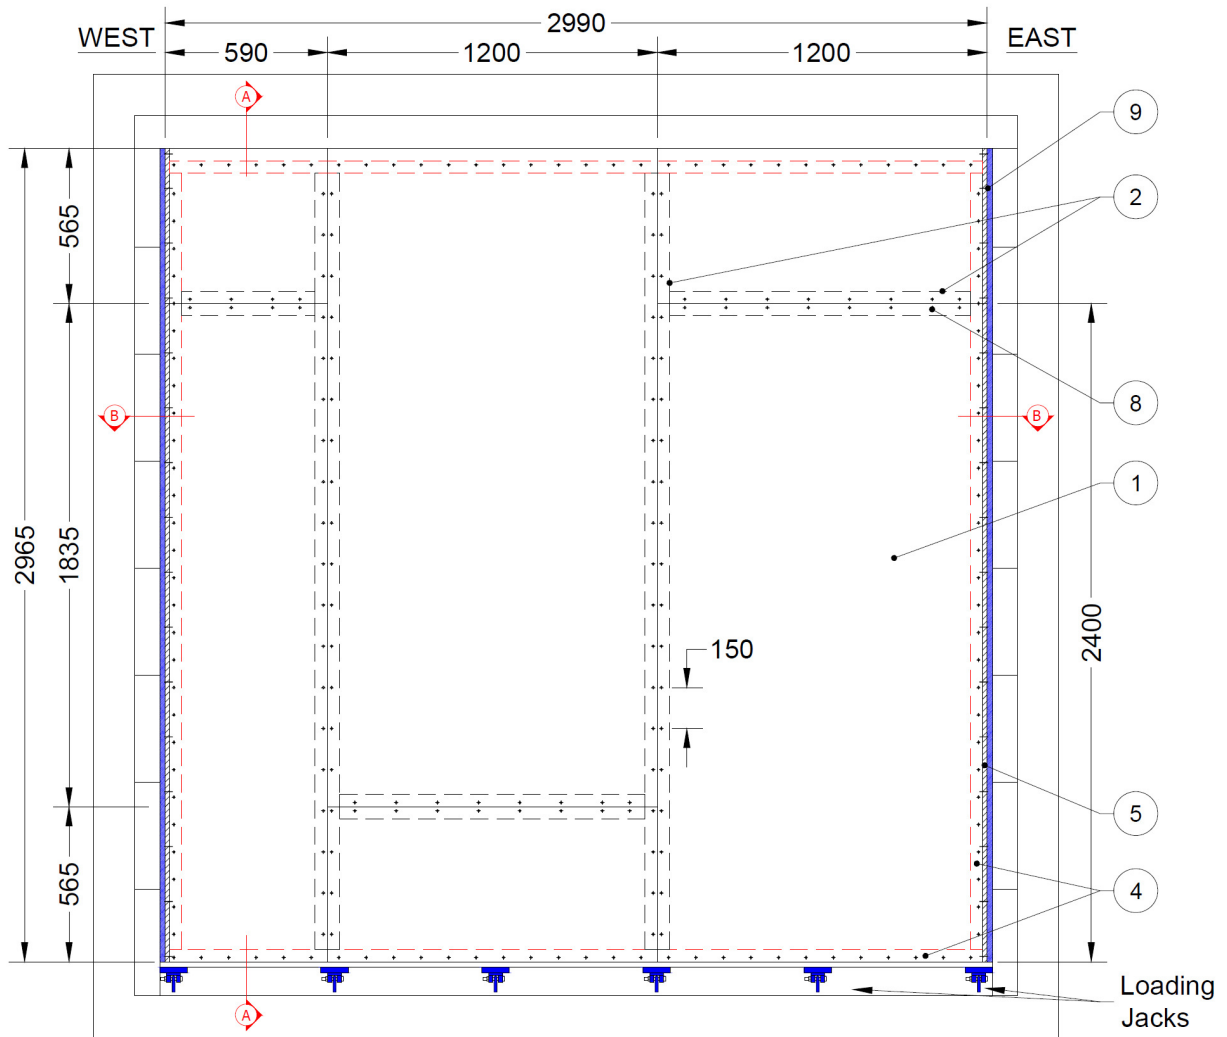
Elevation of Test Specimen (Unexposed side)
